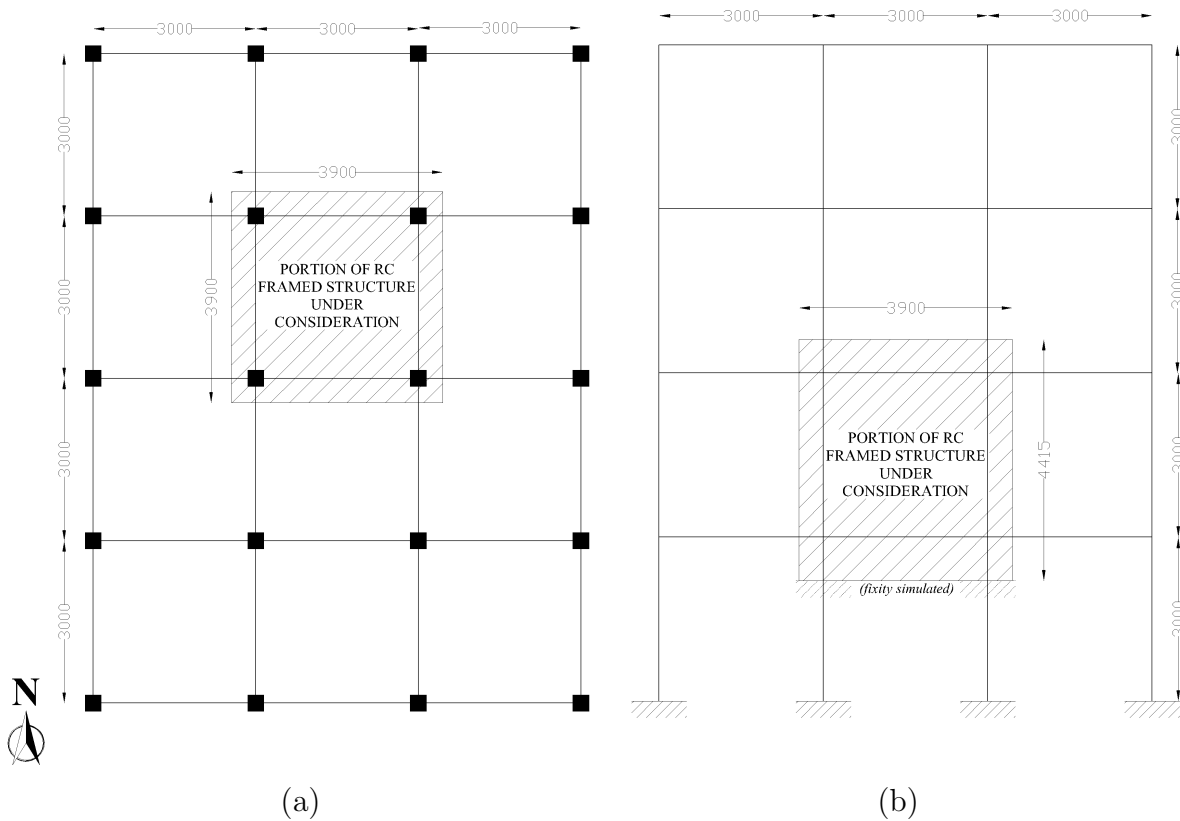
RC structure layout (a) In plan (b) In elevation
